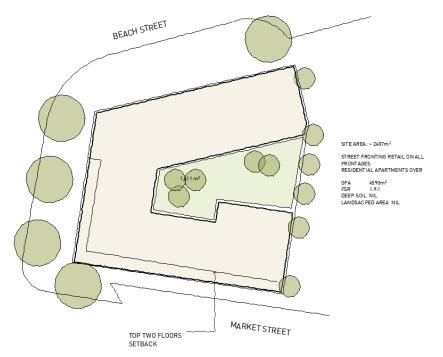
BEACH STREET FRONTED SITE WITH 15.5M STOREY HEIGHT LIMIT
